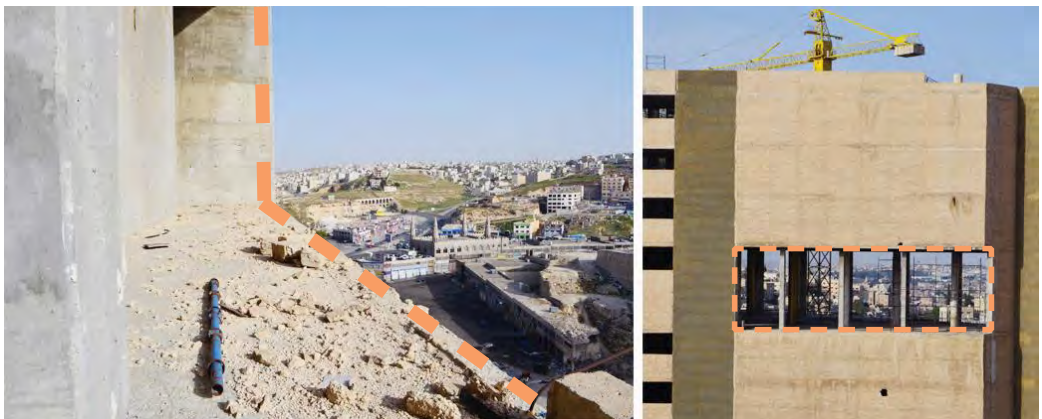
One of the many walls that collapsed in the 10th floor (Aljabi 2016)
